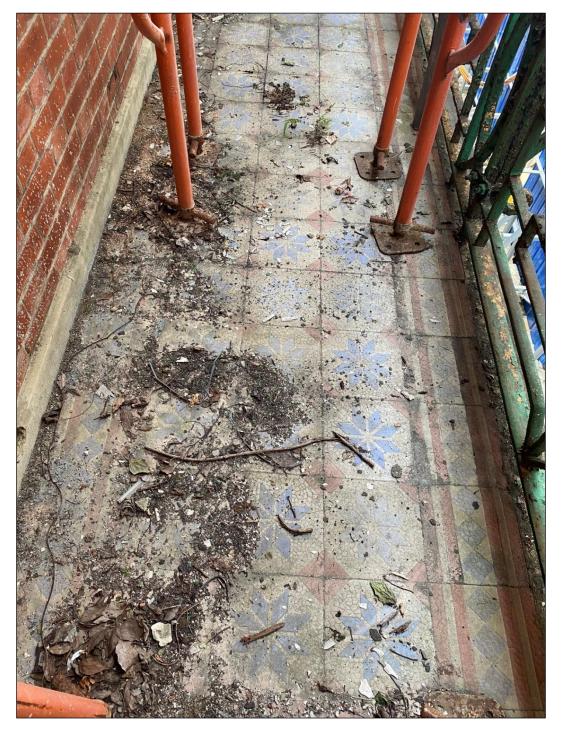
Main Building, first floor, verandah at main façade, encaustic floor tile with border, (photo courtesy from Employer), (10<sup>th</sup> October, 2024)
